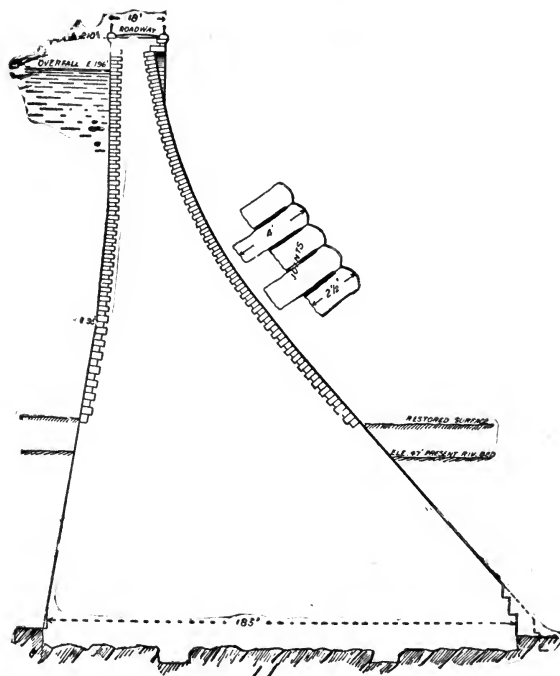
CROSS-SECTION OF MASONRY DAM. NEW CROTON DAM. CORNELL'S.
